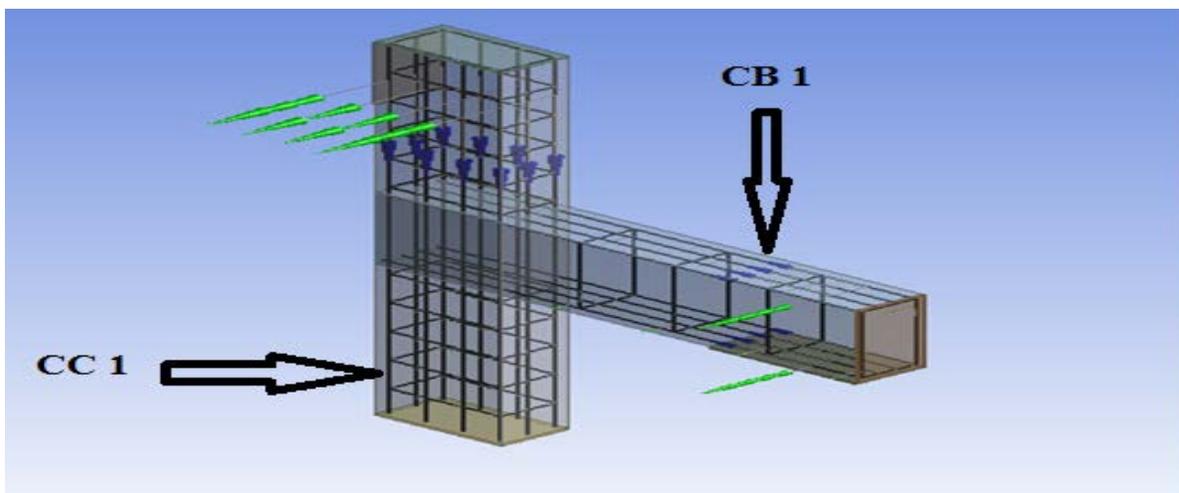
Geometric model and reinforcement detailing of Exterior joint (CS1)
